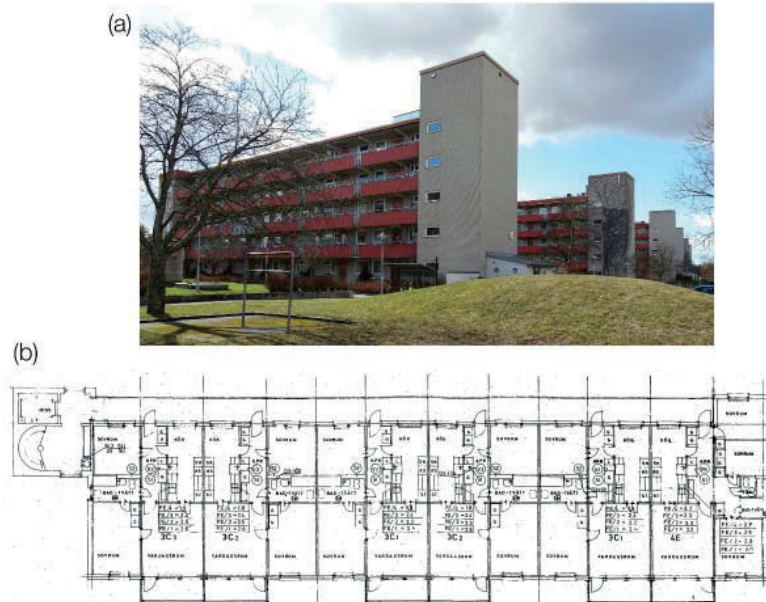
a) Photograph of the long balcony façade and b) typical floor plan of an “exterior circulation” development, with one stairwell providing access to six apartment units. One of the depicted buildings was included in the simulation study. The photograph in Figure 3.7a was taken by architect and photographer Holger Ellgard and is licensed under CC BY-SA 4.0. It was cropped for Figure 3.7a. Figure 3.7b was retrieved from the municipal drawing archives of Stockholm (“Stockholm stad, Bygg och plantjänsten (In English: Stockholm city, Construction and planning service),” 2018).
